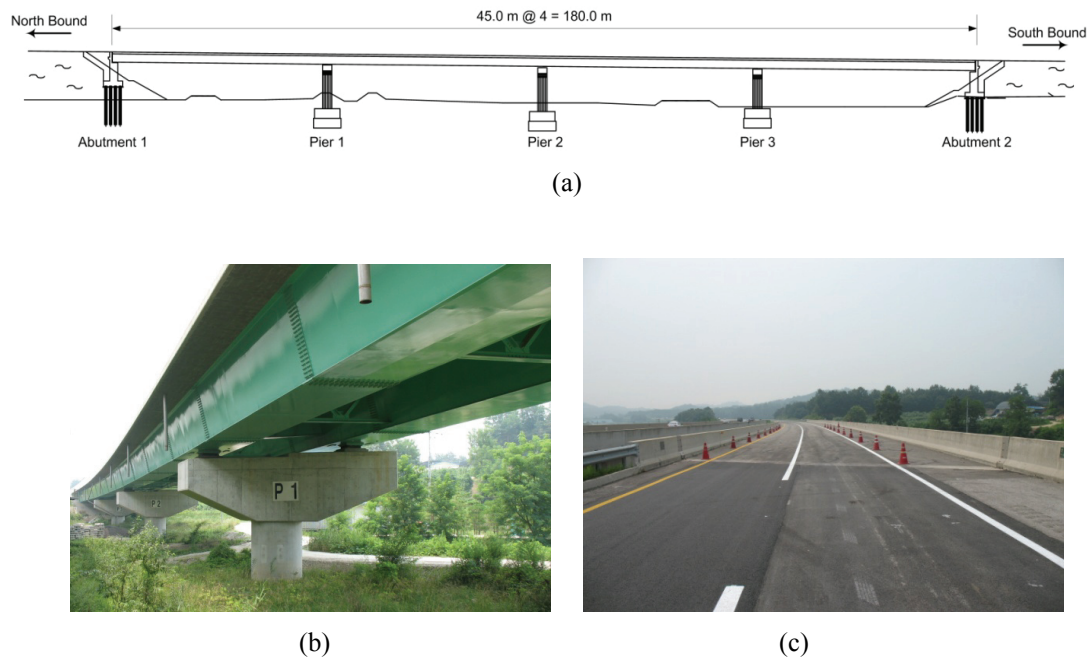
Yeondae Bridge: (a) profile schematic of the bridge; (b) perspective view at the northern abutment (the curved plan is evident); (c) view at the top road surface.
